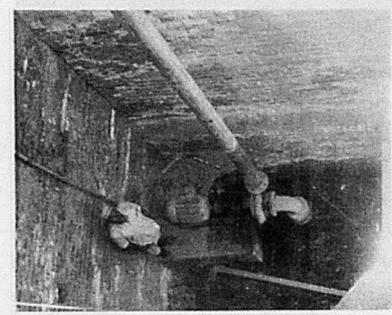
Inside view of well - Fillings of motor, pump and foot-valve above water surface
